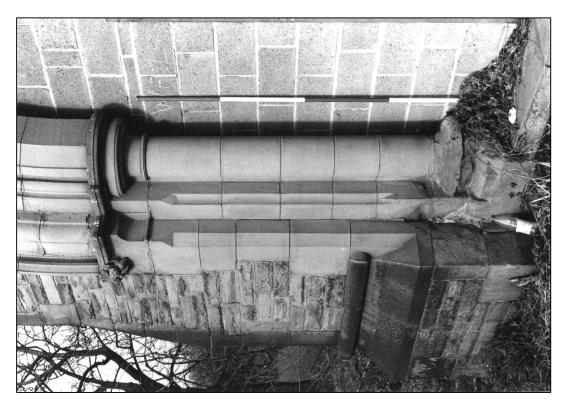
South porch, west side, looking NW (photo 1/6) (top to left).
